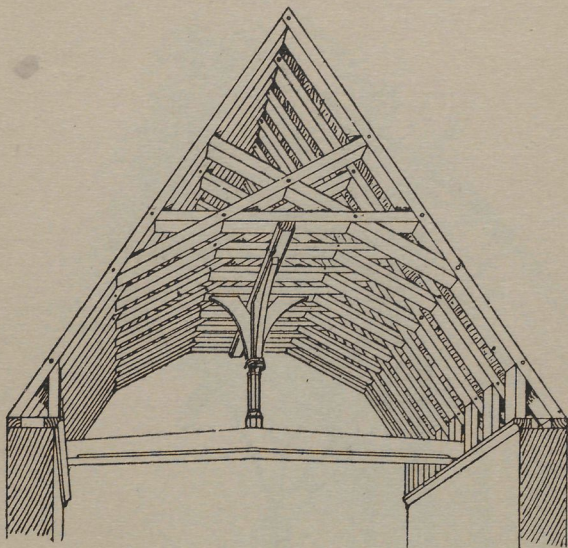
TRUSSED-RAFTER ROOF, WITH RUDIMENTARY PRINCIPAL
